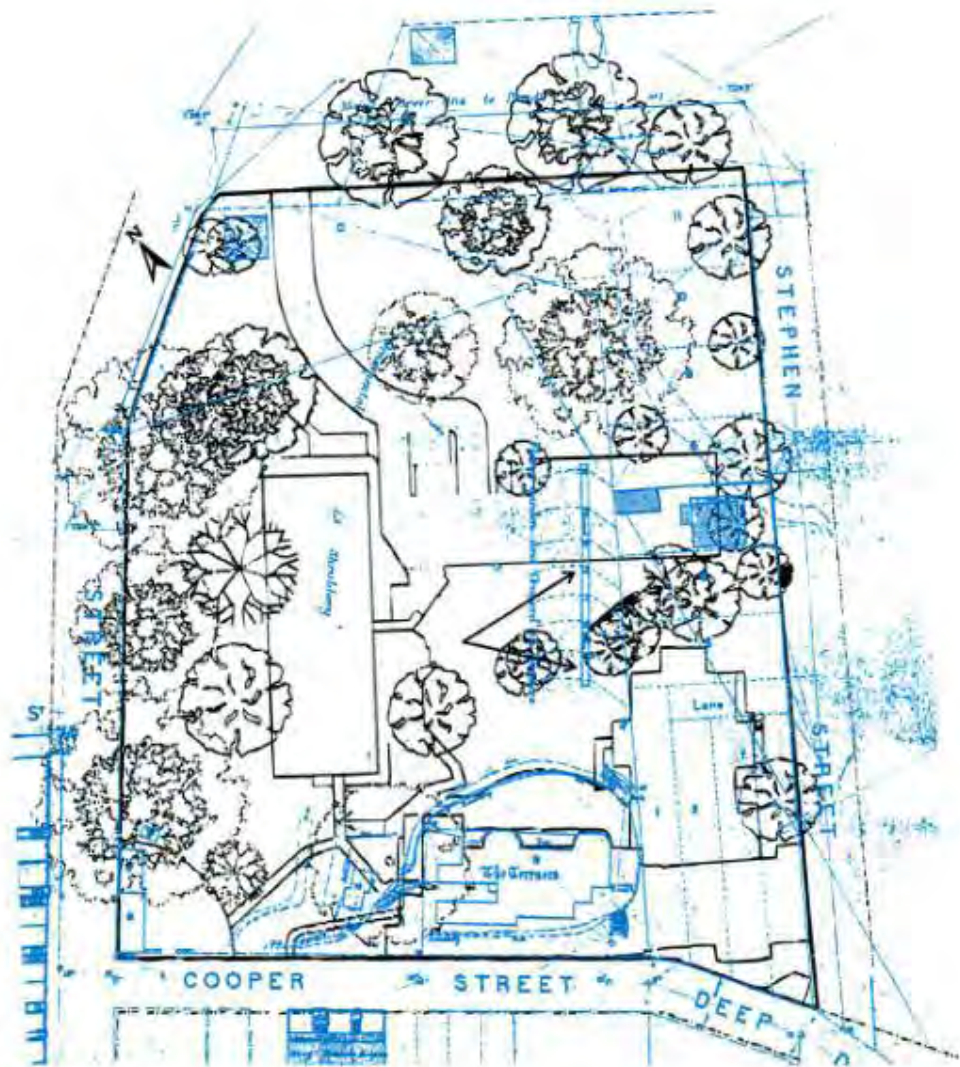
Modern site layout overlaid onto 1883/89 plan, indicating section of stairs uncovered.
